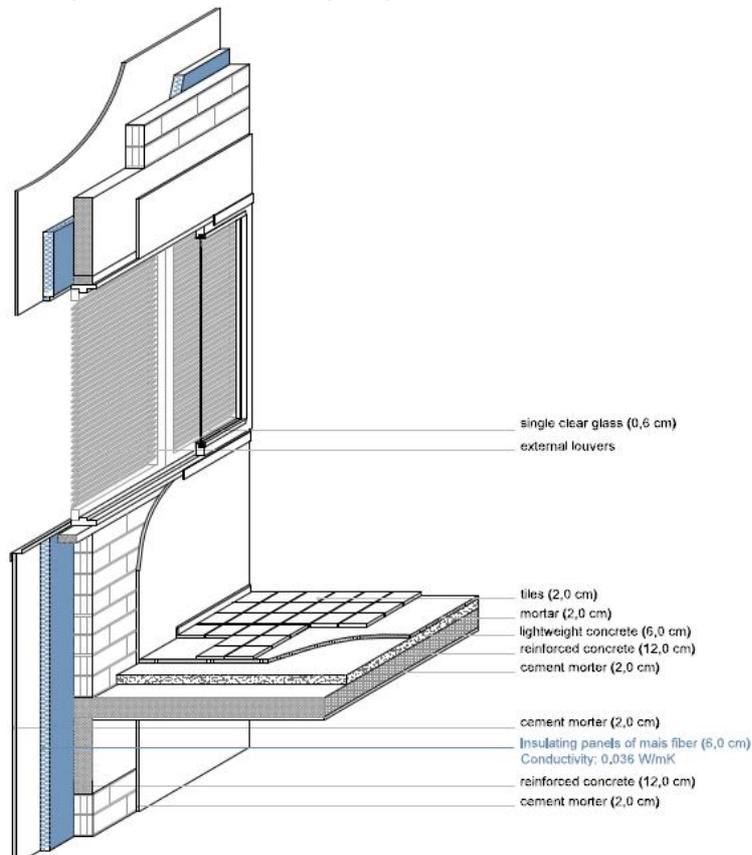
Detail 02 - wall, window and floor connection after intervention from inside
